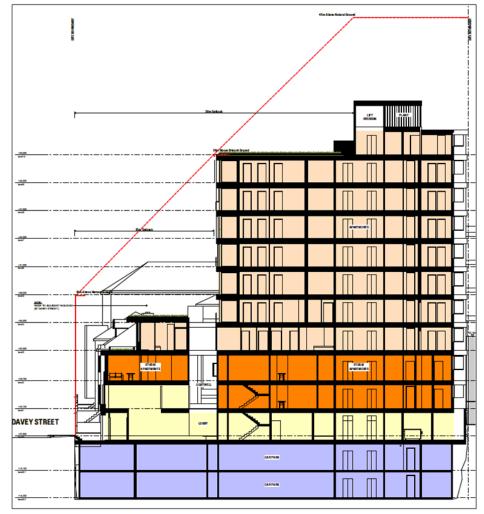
Eastern elevation illustrating the permitted building envelope (source: JAWS Architects)
